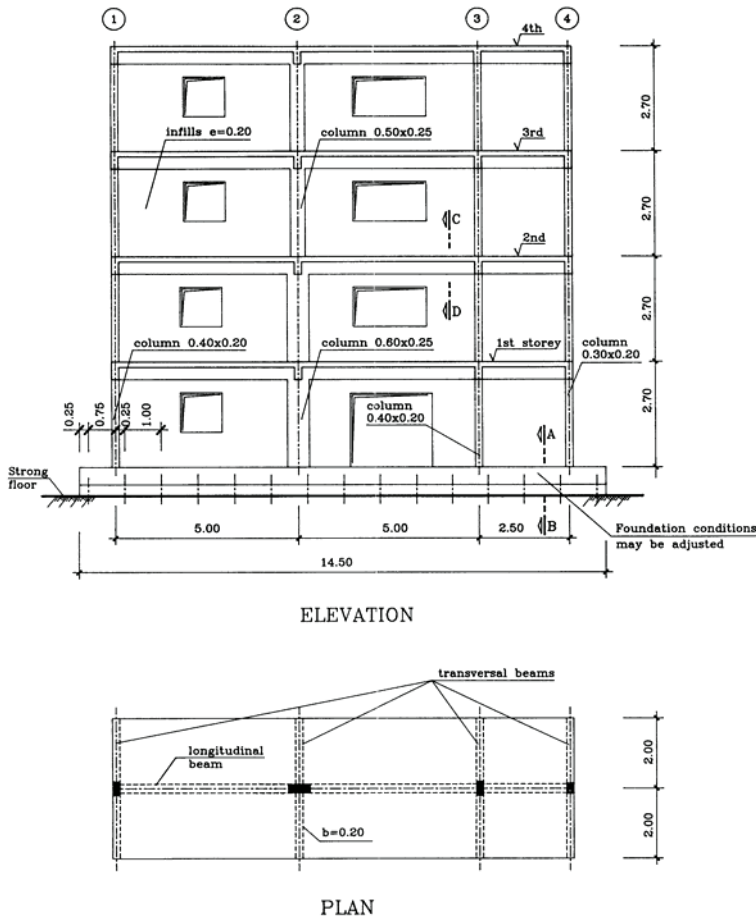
Elevation and plan views of the frame, after Carvalho *et al.* (1999)
